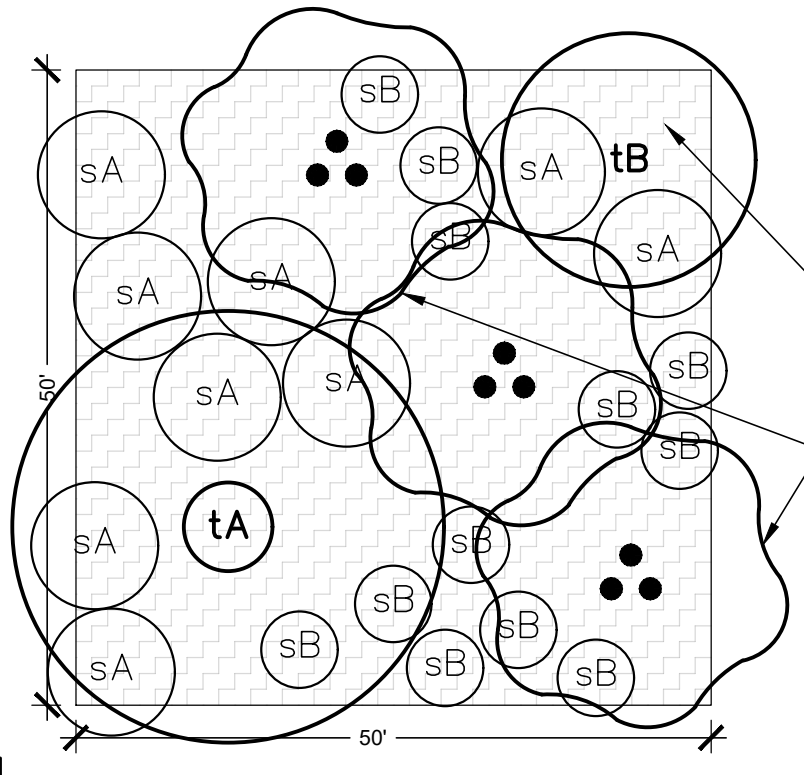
B. PHASE 2 PLANTING PLAN
